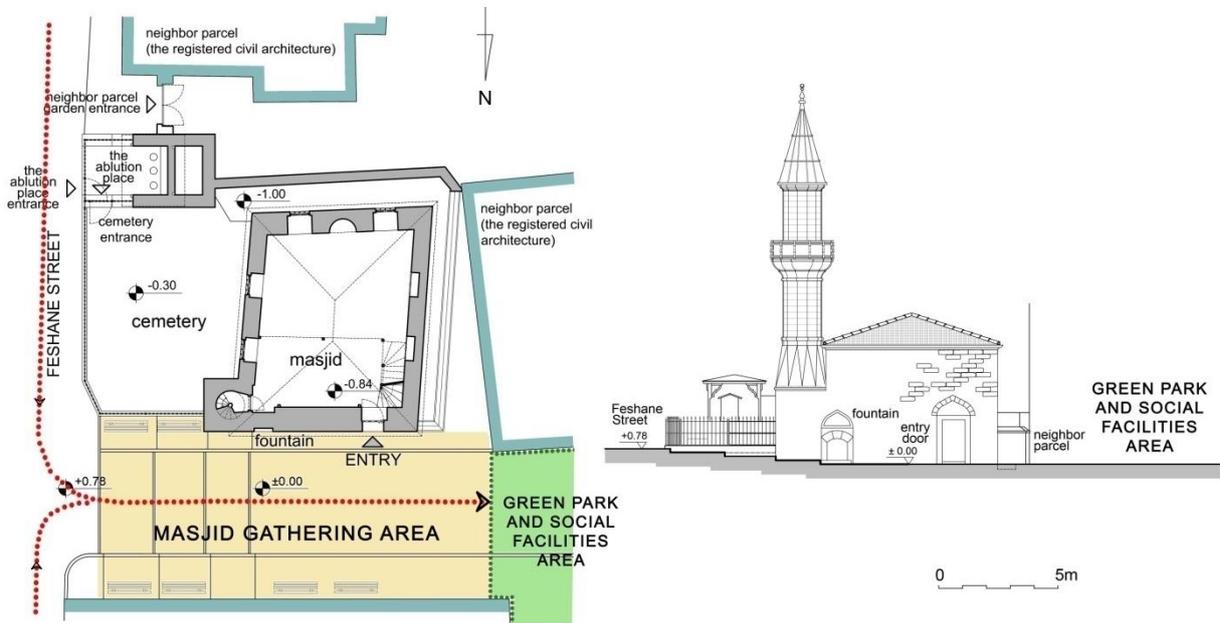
Proposed restoration plan and the North view of Çeribaşı Masjidi
